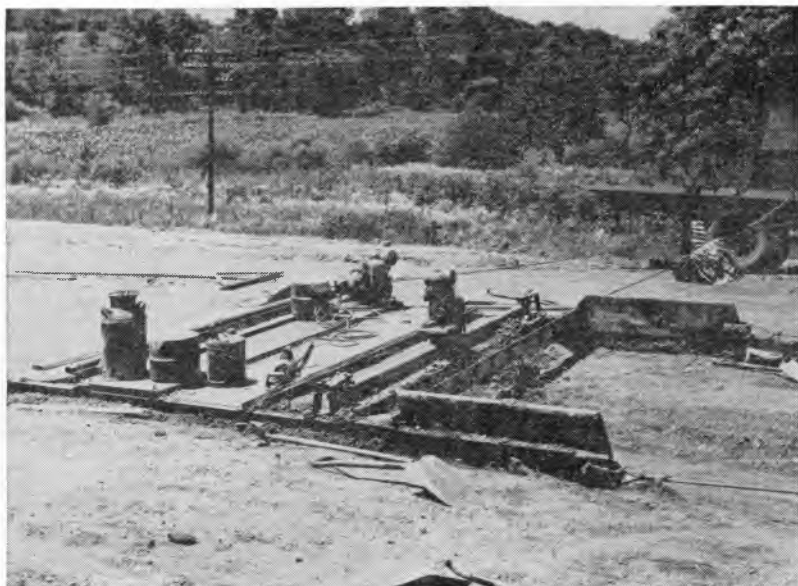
First machine developed to construct an 11-foot lane of concrete roadway without forms.
